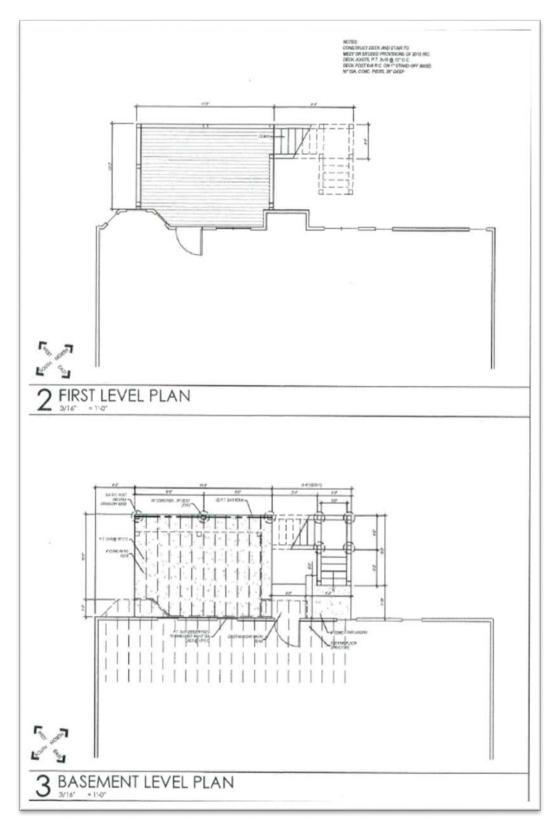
Plans showing measurements of the existing and proposed decks. The existing deck allows for a 20 foot, three inch rear yard while the proposed deck allows for an 18 foot, three inch rear yard.
